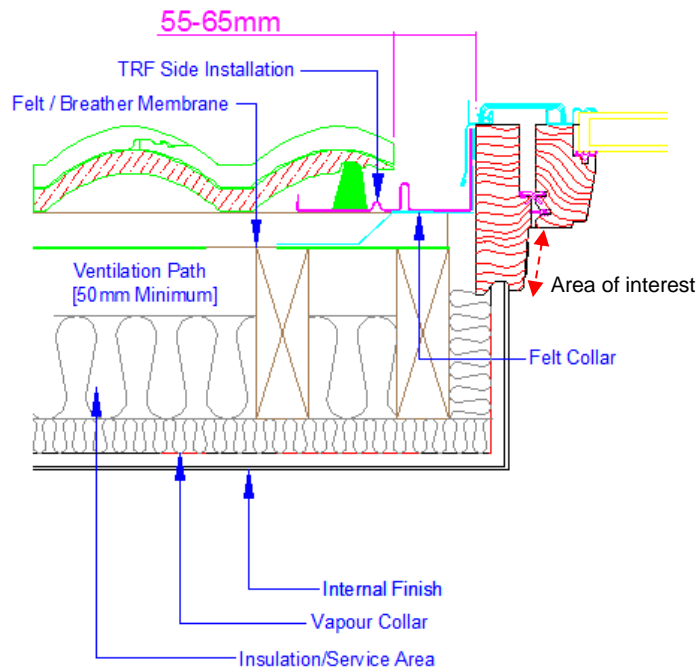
Left hand side of roof window/jamb detail without Keylite Thermal Collar. Area of interest indicated by dashed red arrows.
